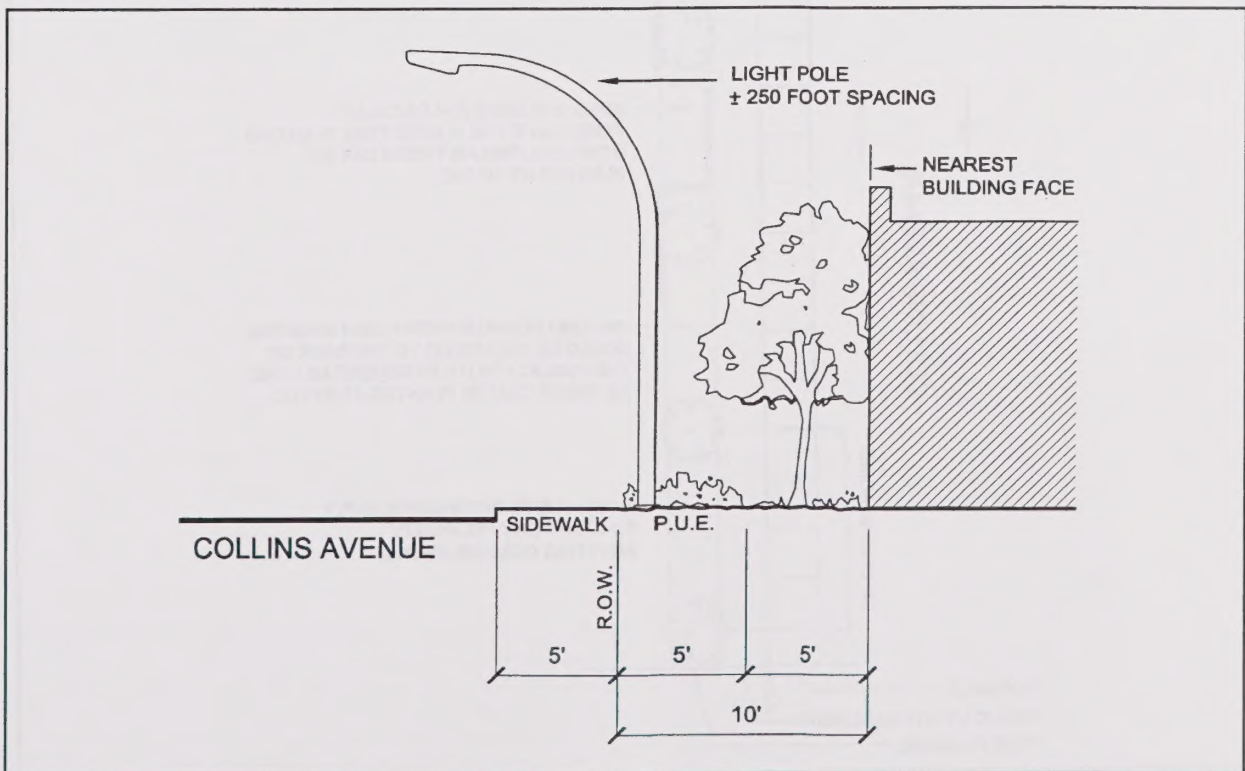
Urban Street Standard, Collins Avenue
